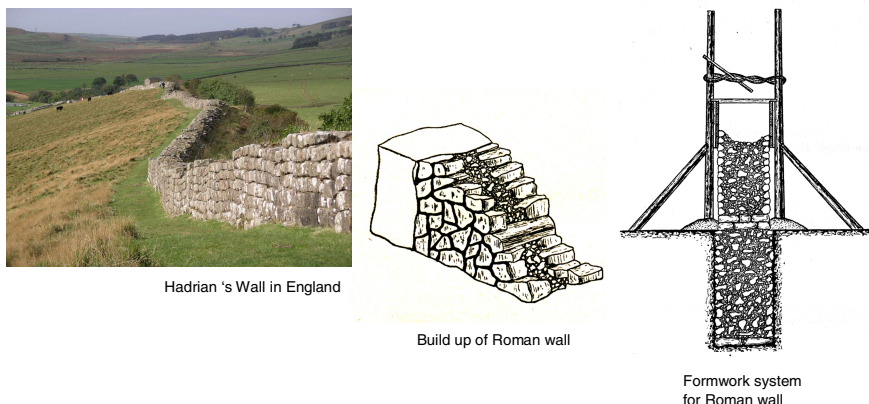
Hadrian's Wall in England and a scheme of Roman wall building
